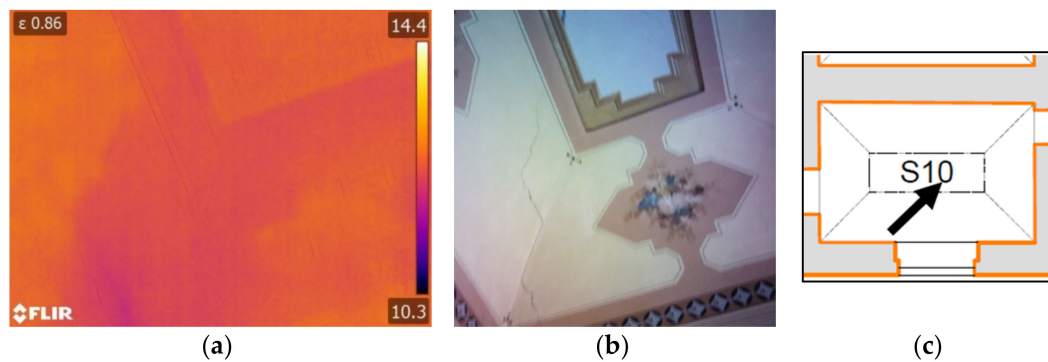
Room S10: (a) infrared image, (b) photography view and (c) plan view.
